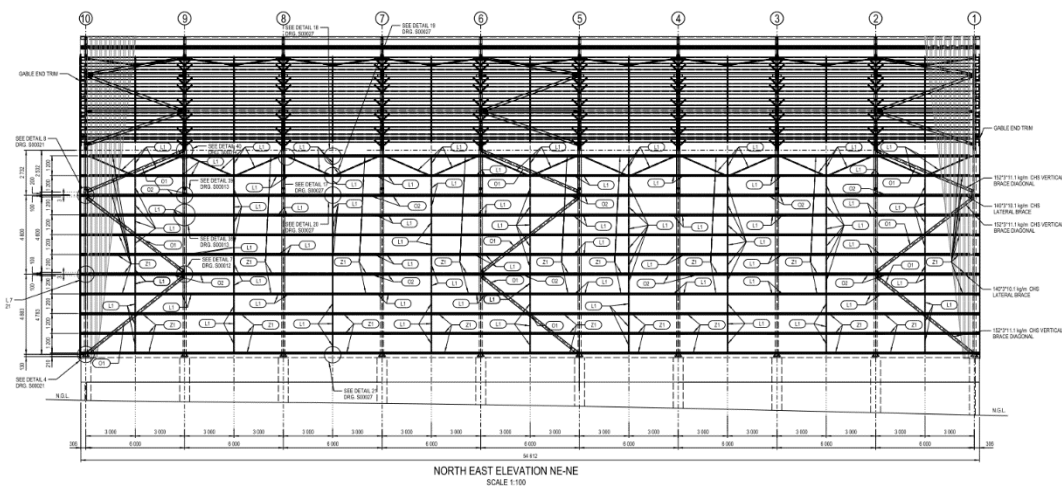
Site E CHS Single Brace Member General Arrangement Elevation (Site E-C1)
